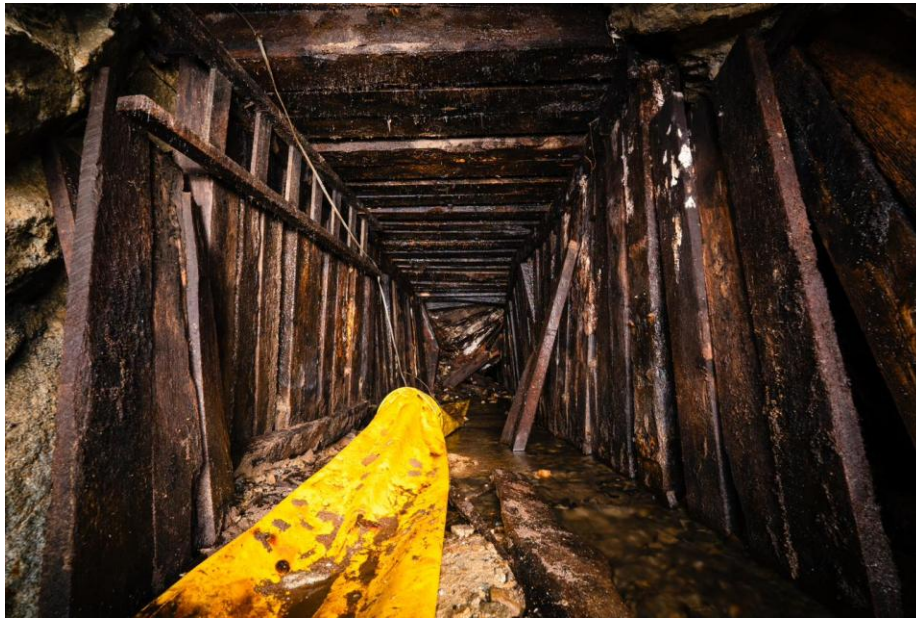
Figure D — Timbered section within the Unity Tunnel, showing original square-set timbering, ventilation line, and the drainage ditch carrying water outbound along the tunnel invert.
